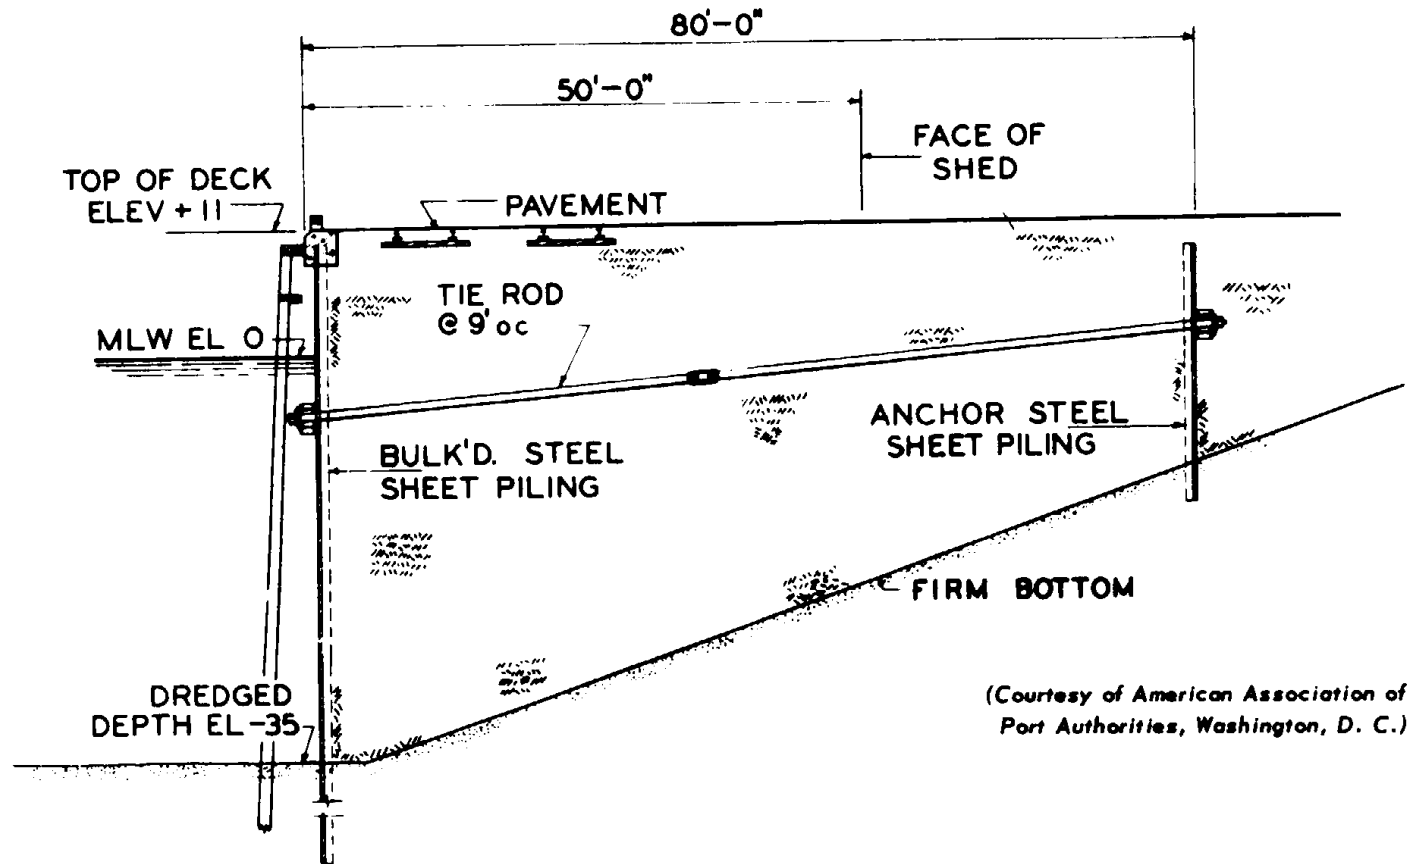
Solid fill-type wharf construction with steel sheet pile bulkhead.
